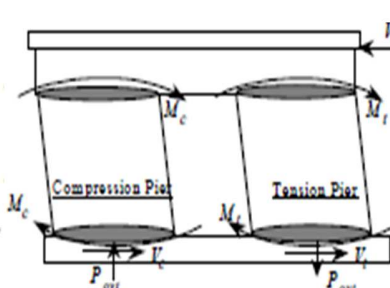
Strong Spandrel/Weak Pier Failure Mechanism Elshafie[32]
